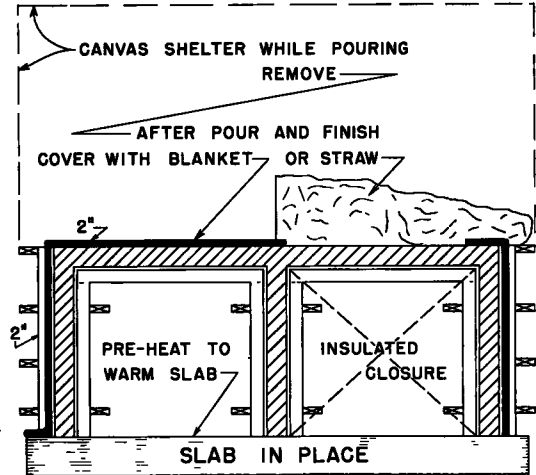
Method of protecting new concrete in concrete box culvert from freezing outside temperatures.
